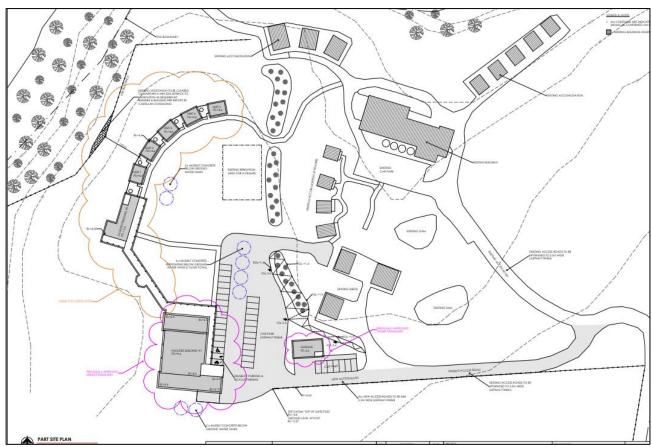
Partial site plan - approval sought for section circled in orange (Source: RFS Projects)
